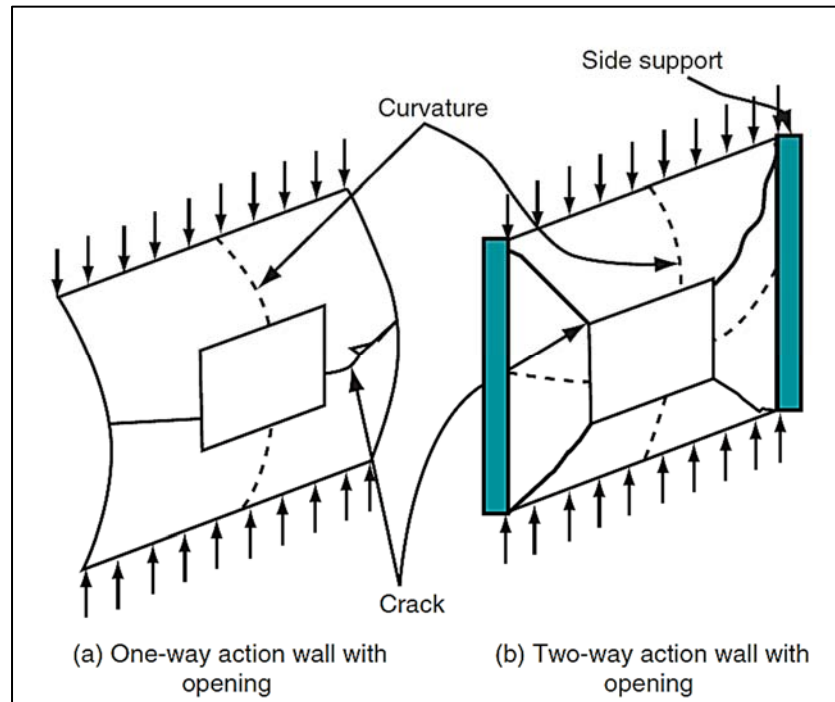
Walls with and without side supports (Doh and Fragomeni 2006).
